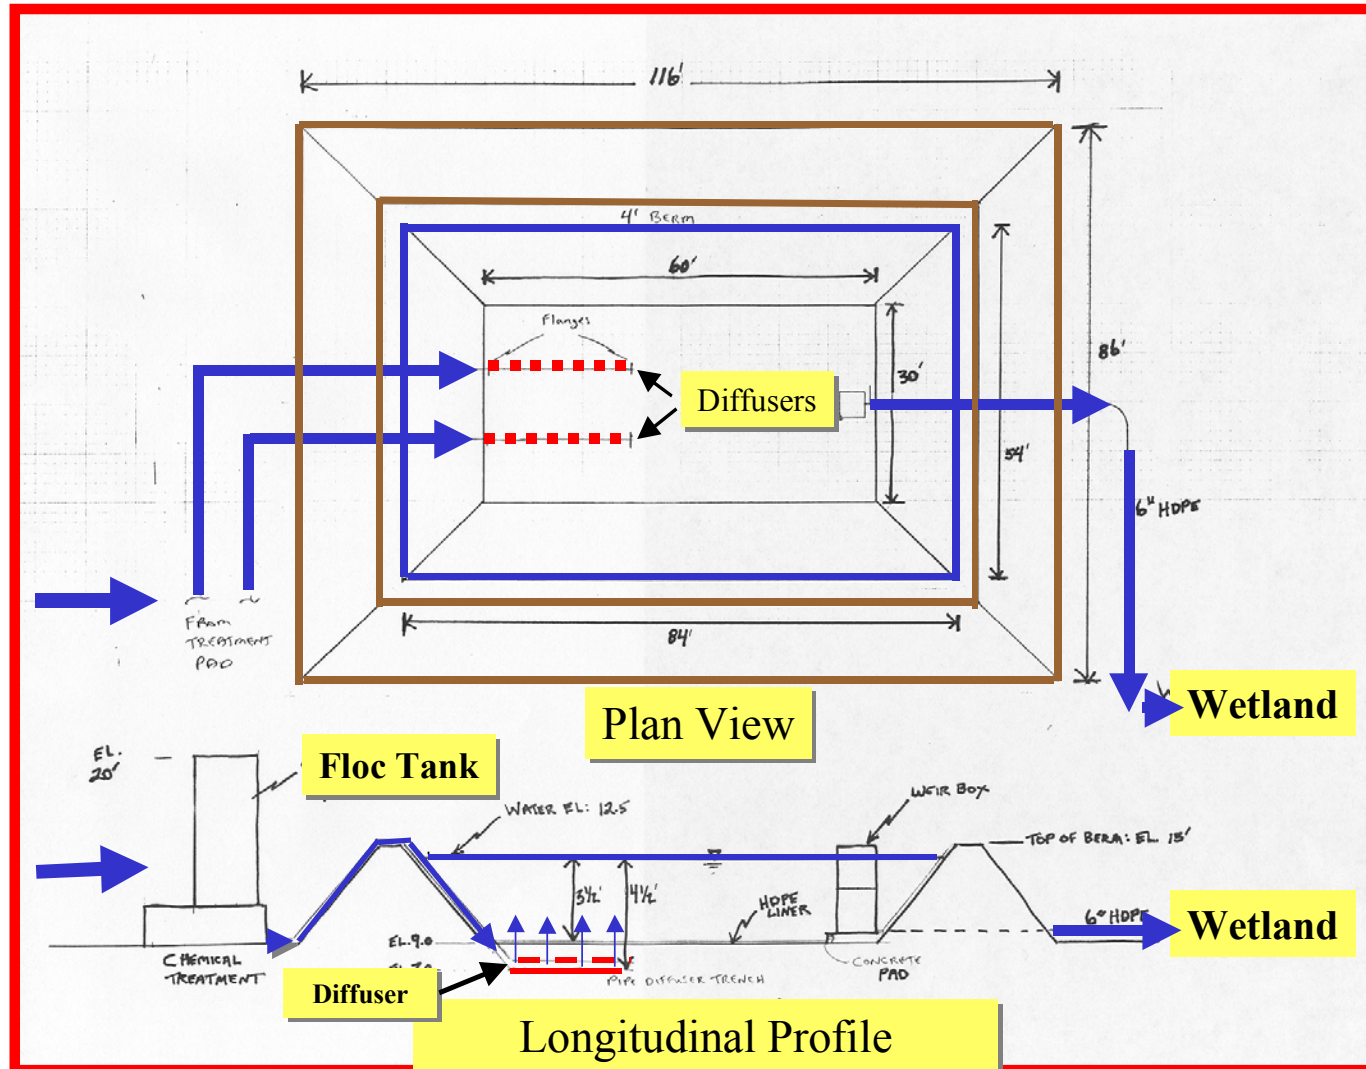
Pond and Trench Treatment System. Plan and profile views.
